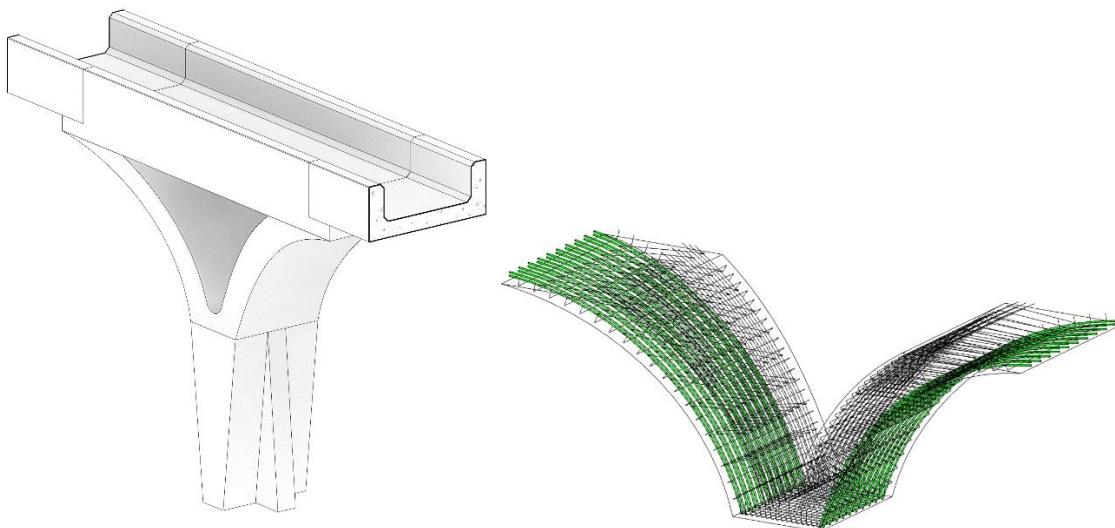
COMPLEX REBAR DESIGN OF DIABOLO PIER
